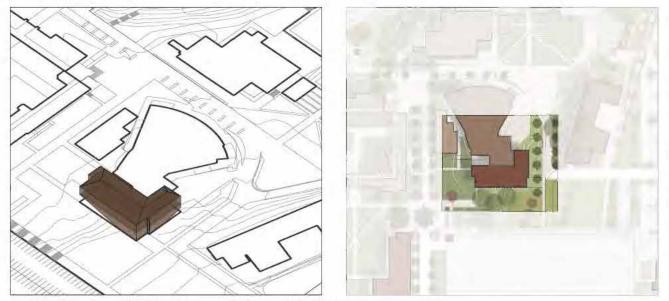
Axonometric and Site Plan of new music building as a Landis addition
